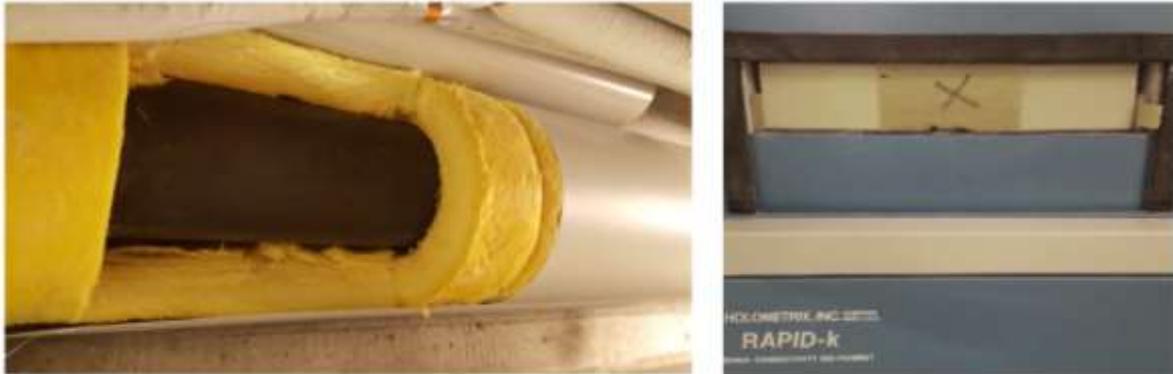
The picture to the left shows the pipe with the removed insulation piece. The image to the right shows parts of the removed insulation when tested using the guarded heat flow meter.
